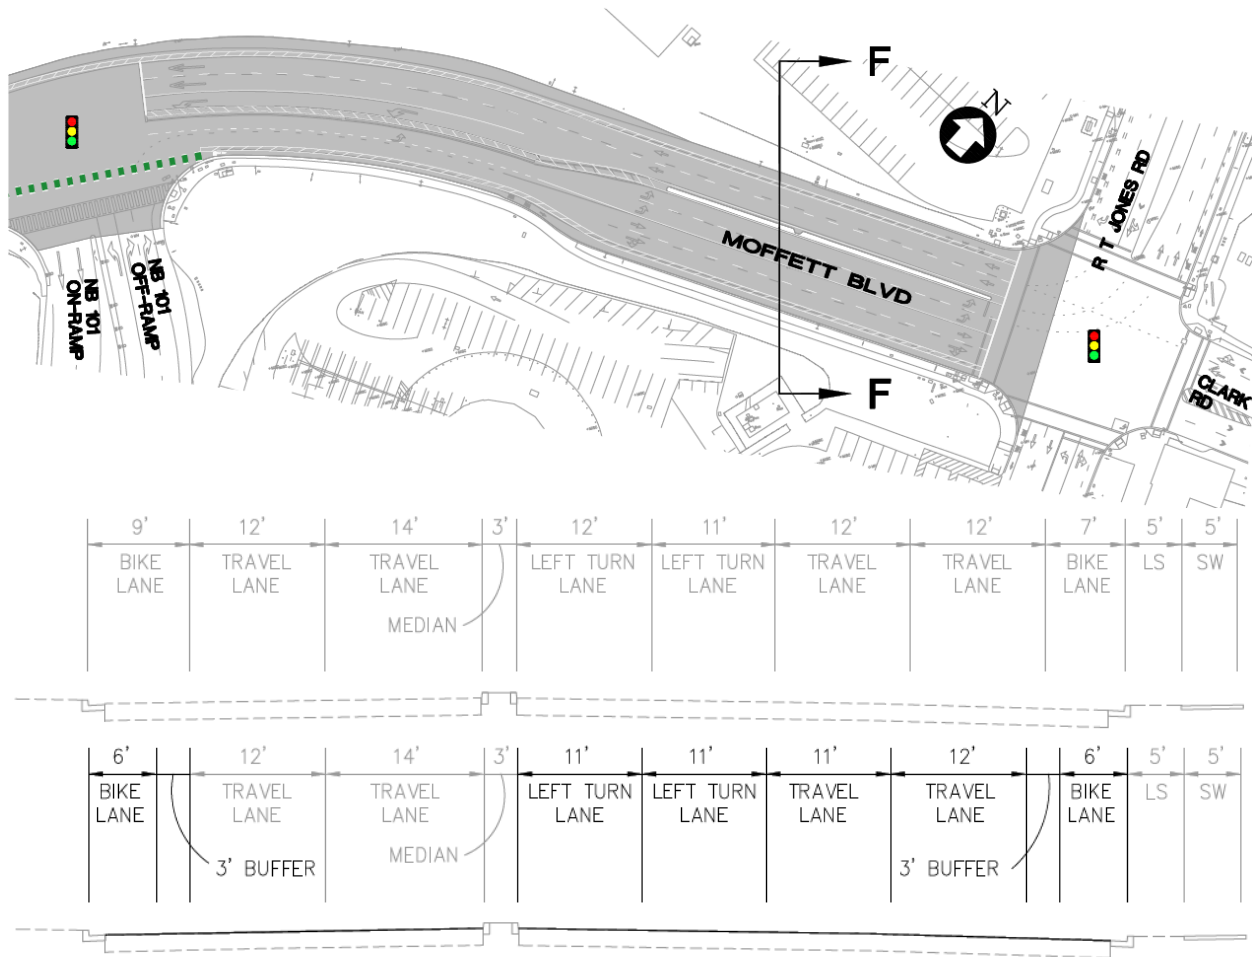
Segment F between U.S. 101 and RT Jones/Clark Road Intersection
